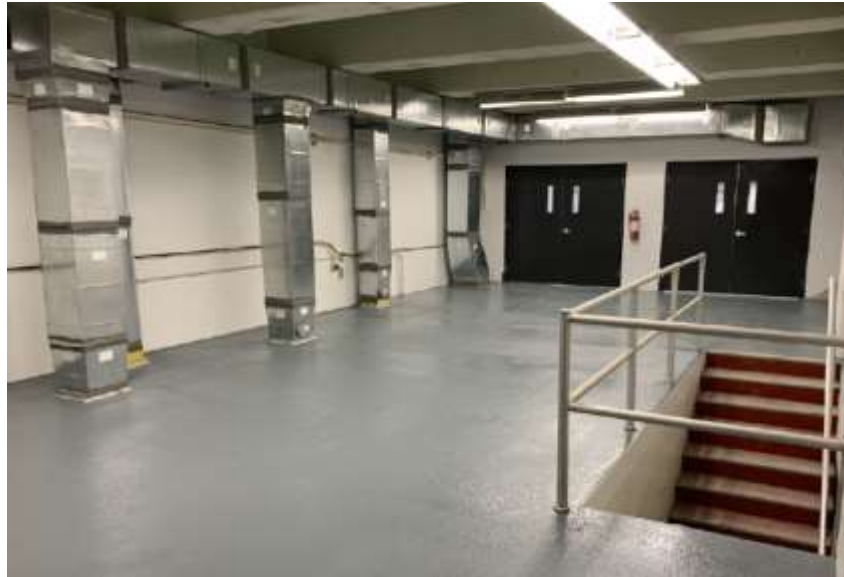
Clover Point Pump Station- Protective Coating Installation at Mezzanine Level
